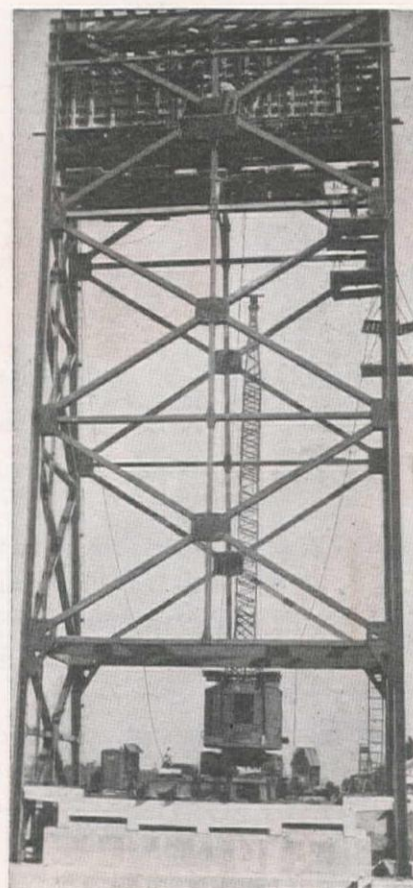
All-welded steel tower assembled on concrete pier.
